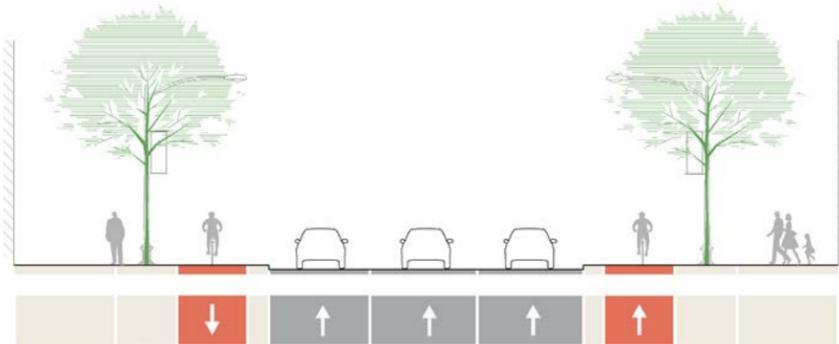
Sixth Street typical section Brazos Street to Guadalupe Street
